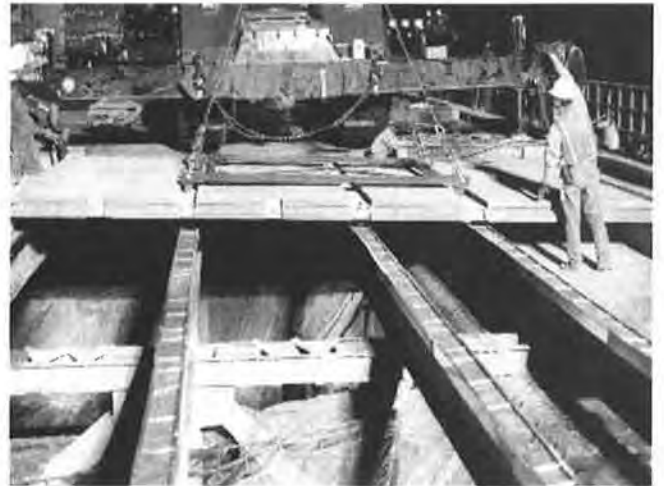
Setting of first exodermic panel, Tappan Zee Bridge.
